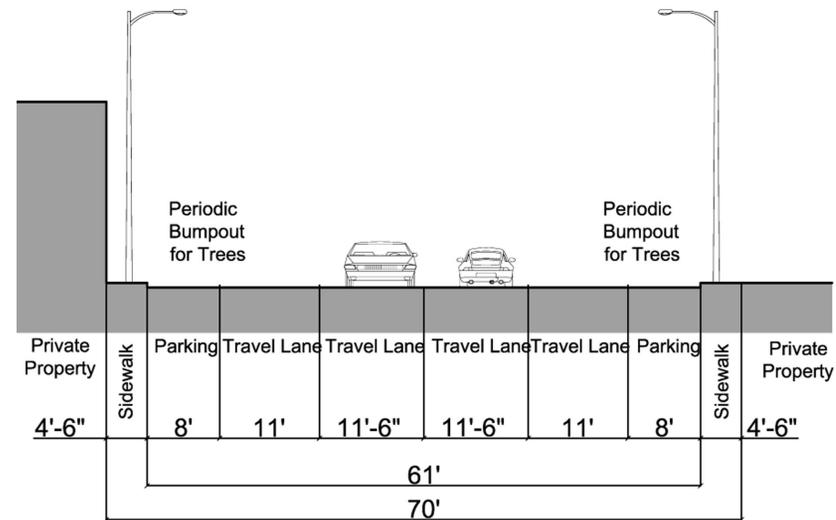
Minimum existing cross-section for Garfield Avenue.
